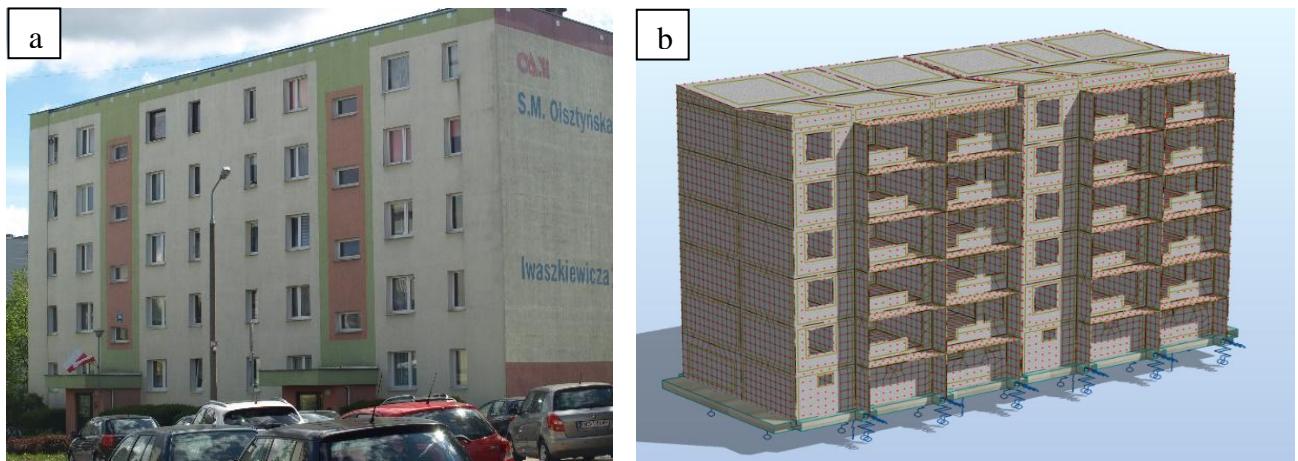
Residential building of the Wk-70 large-panel system (F.D. Hawa) - 5th floor: a) northern facade - photograph; b) southern facade - FEM 3D model of the building structure based on Winkler (Bieranowski P. 2018/19)
